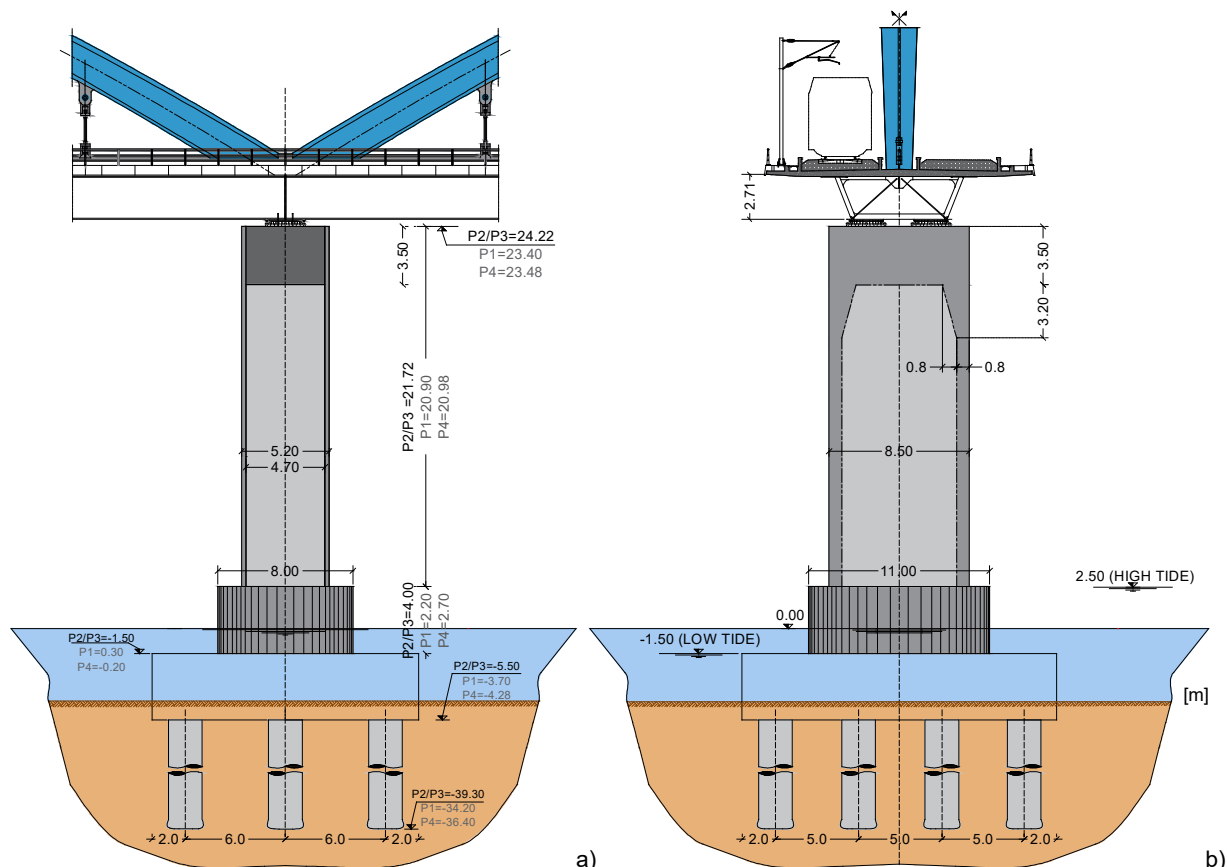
Bridge details: a) side elevation, b) front view (adapted from GRID et al. (2006)).
